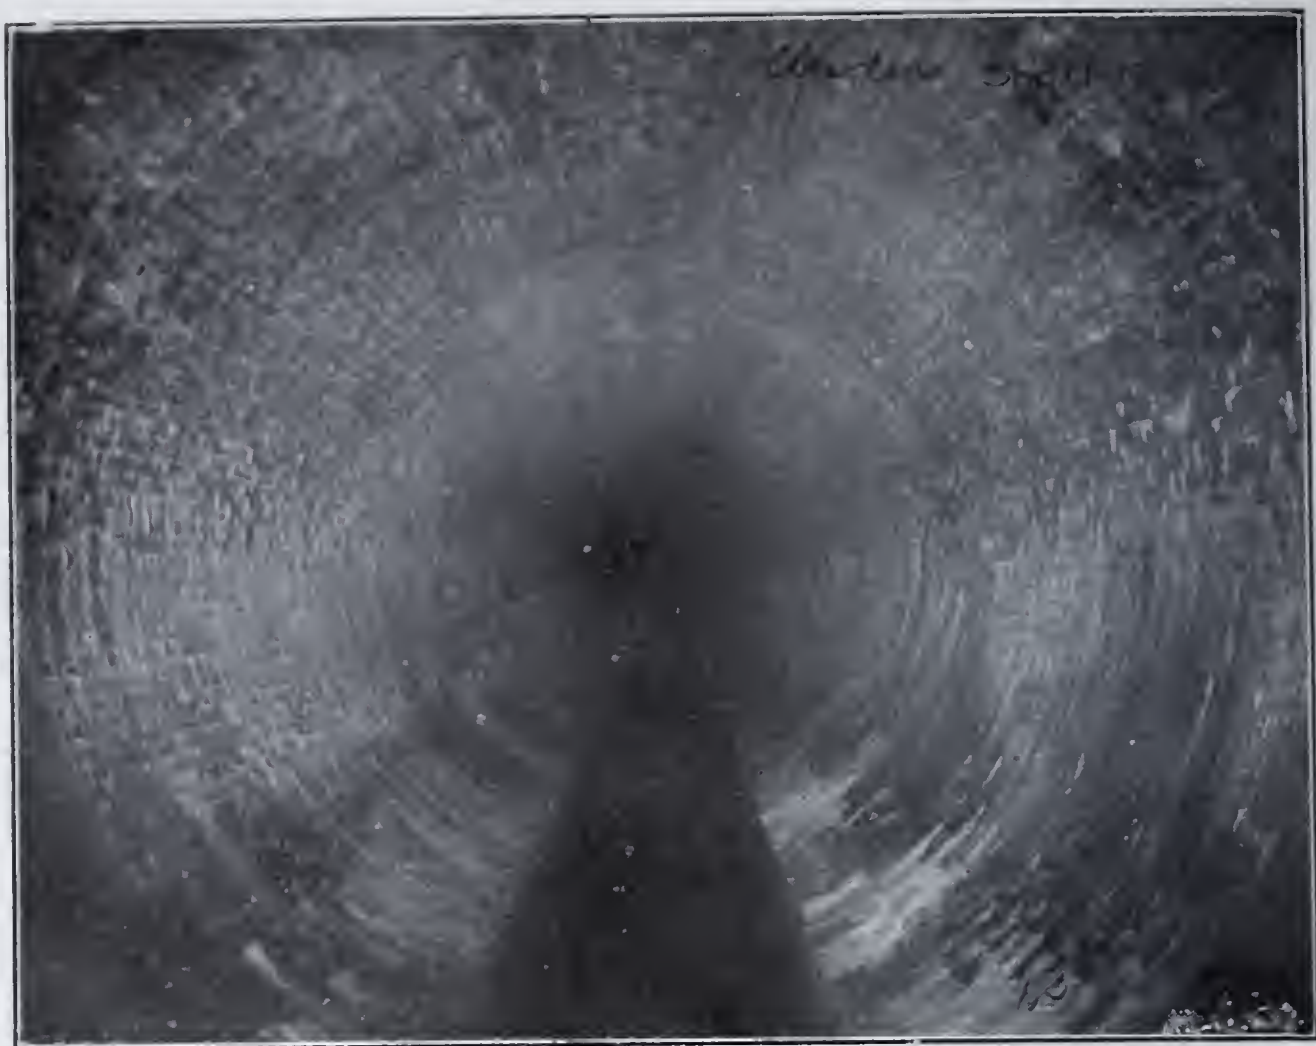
PLATE XXIII.—LINING OF TUNNEL UNDER SHAFT NO. 6.
